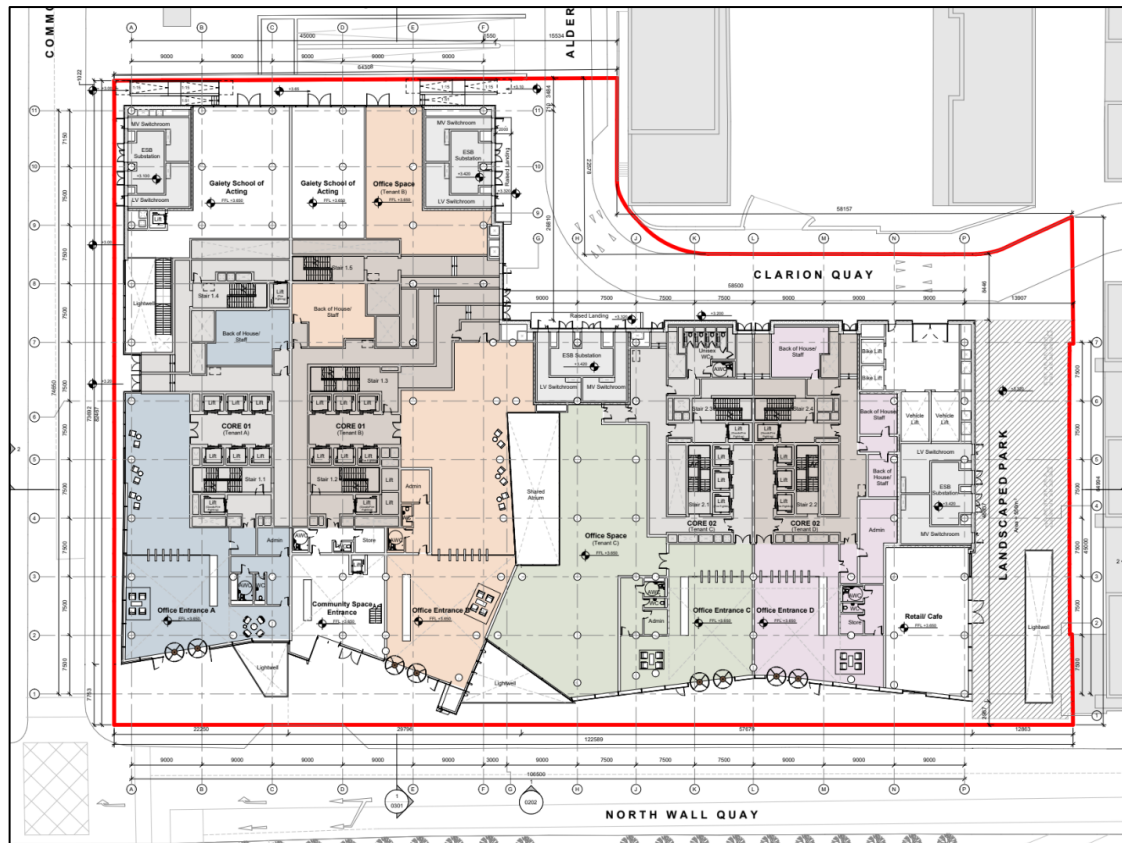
Proposed Development Ground Floor Plan (Source: 1NWQ-HJL-AX-00-DR-A-0100)
